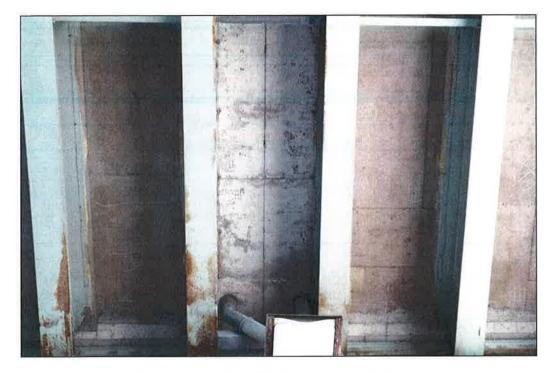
Typical Condition of Soffit (Bent 301-302) (fair-to-poor condition – stained and unstained cracking, delaminations, spalls, patches, wet areas and light scaling)
